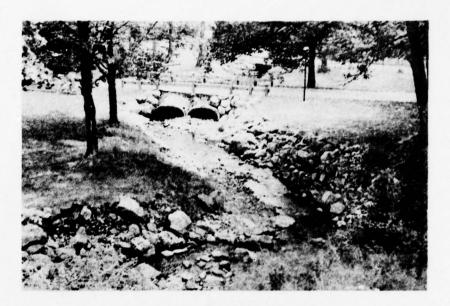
Downstream drainage channel, private road, culverts and highway bridge in background.
